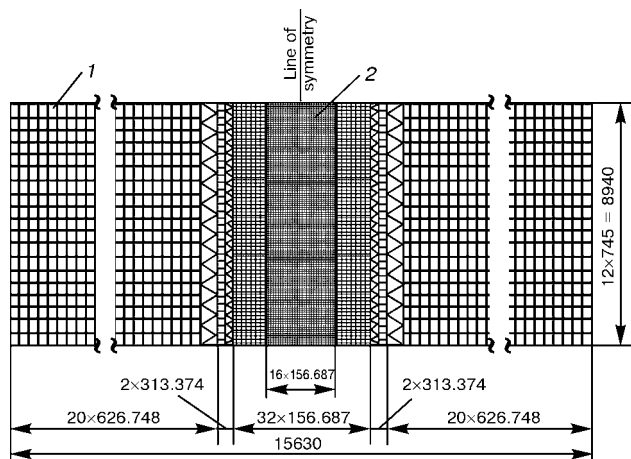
Schematic of finite elements of wall sections 1 and 2 (reinforced area is high-lighted)
